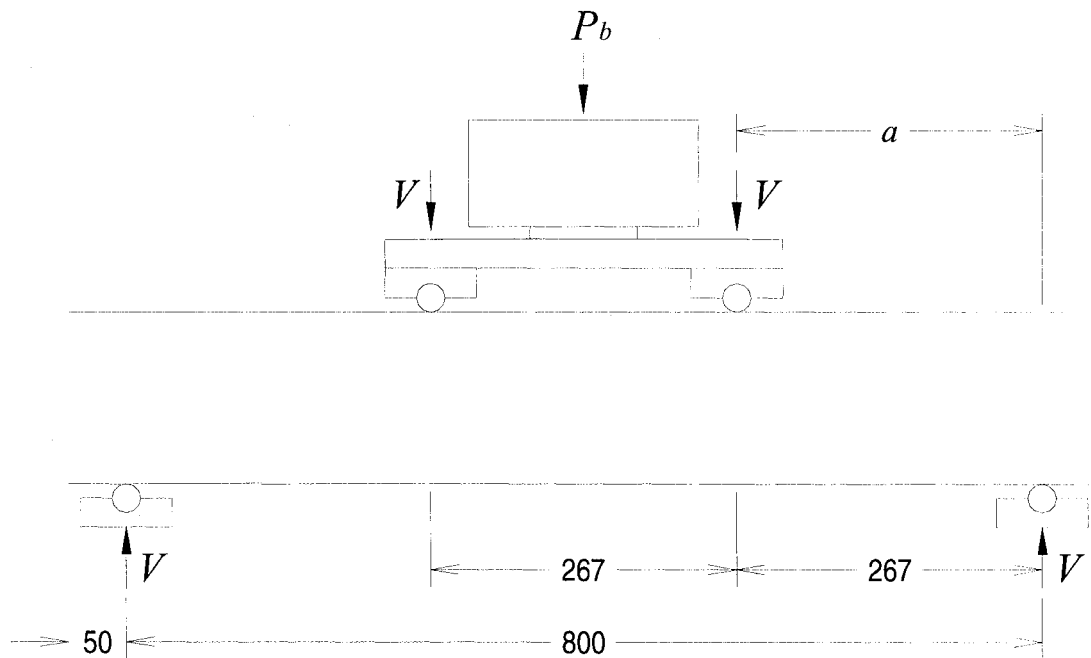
Testing Set-up for Reinforced Concrete Beams
